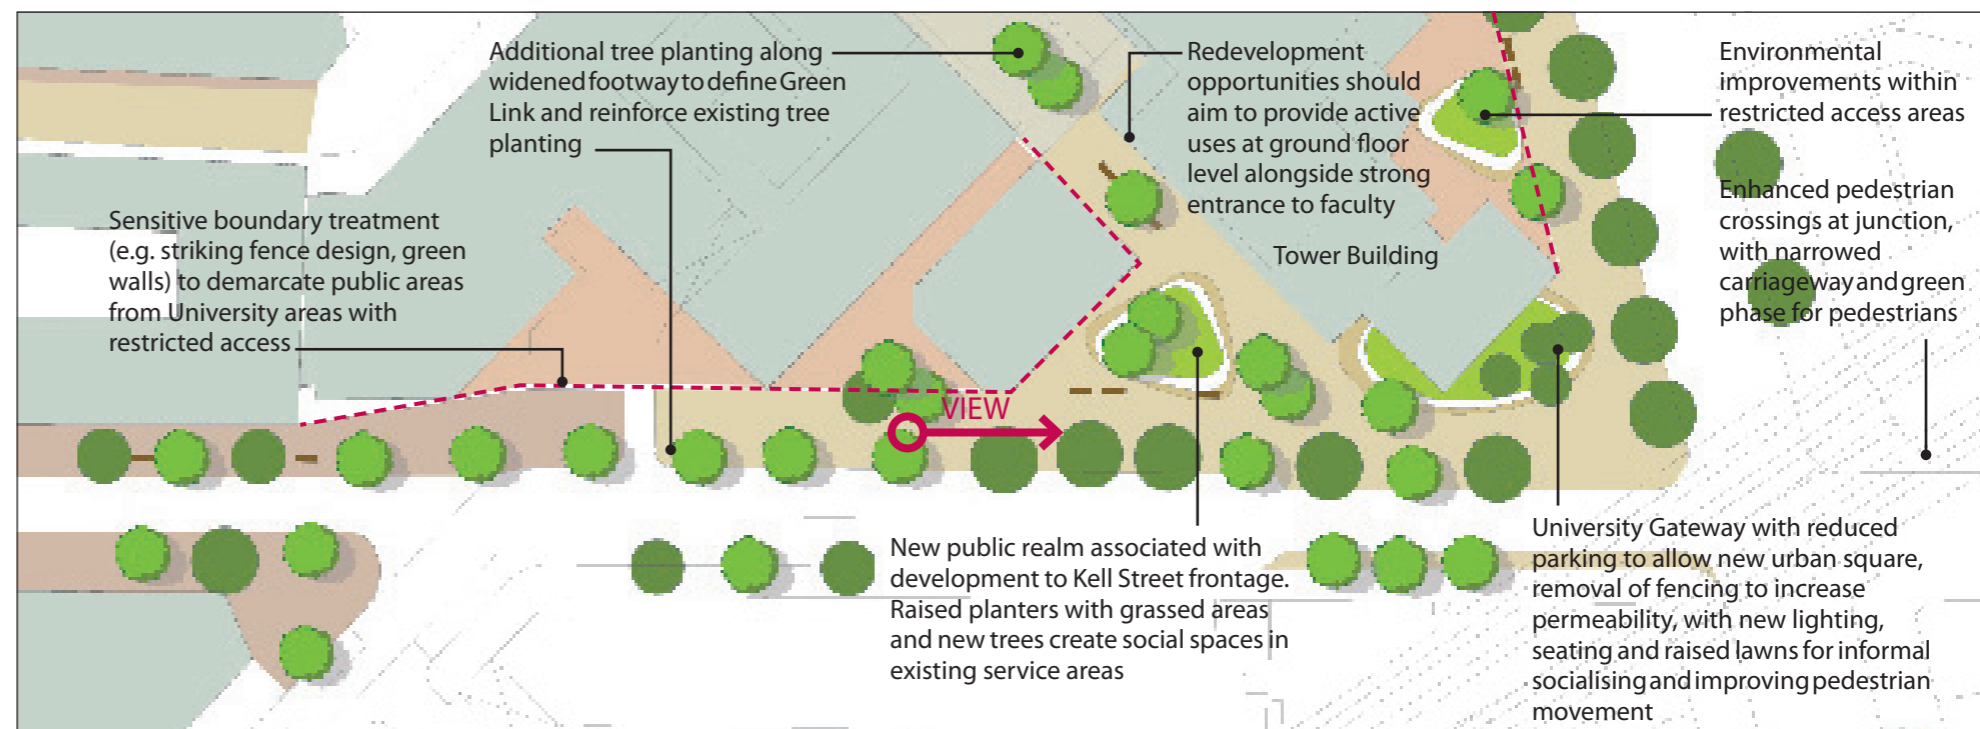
Illustrative plan of Southwark Bridge Road Gateway
